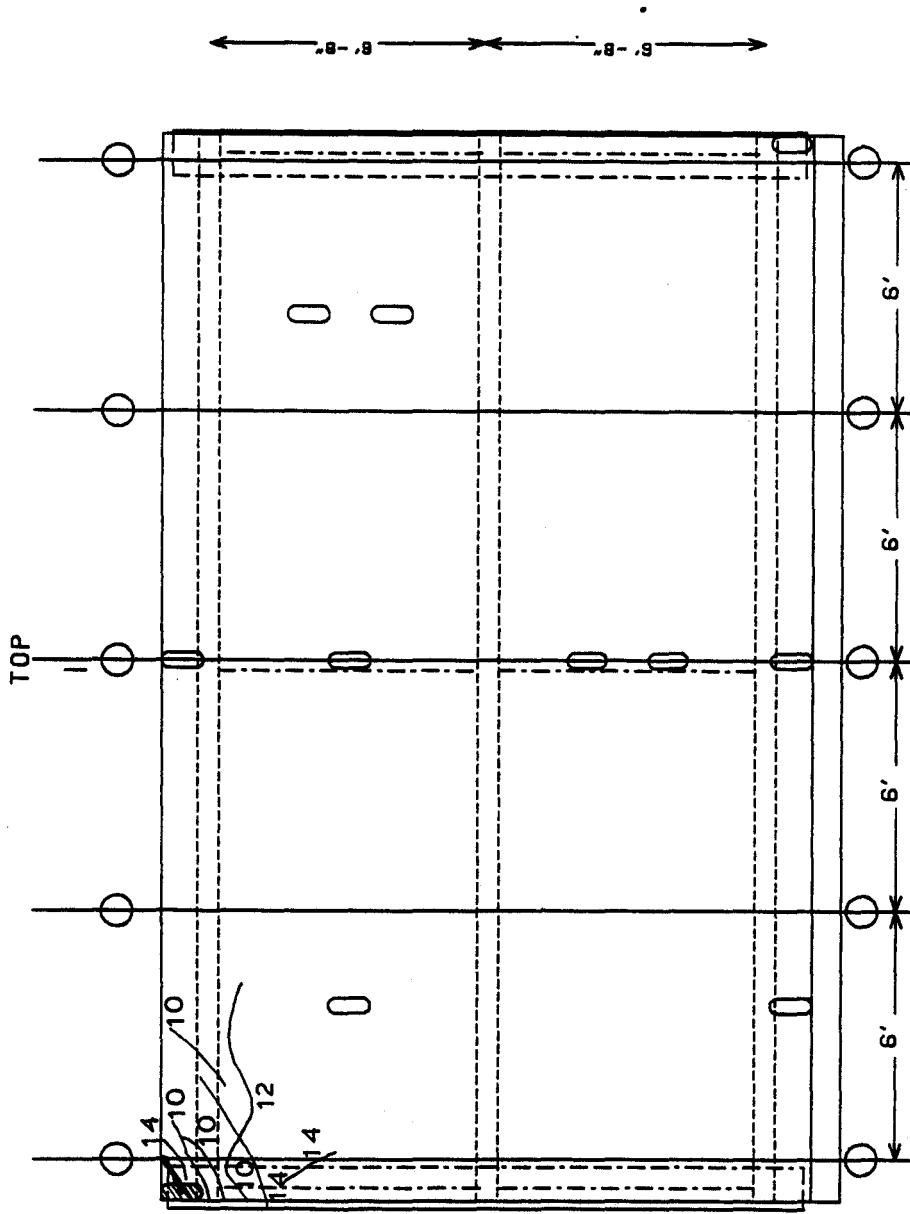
Top Cracking Pattern (First Bridge - Test No. 9)
